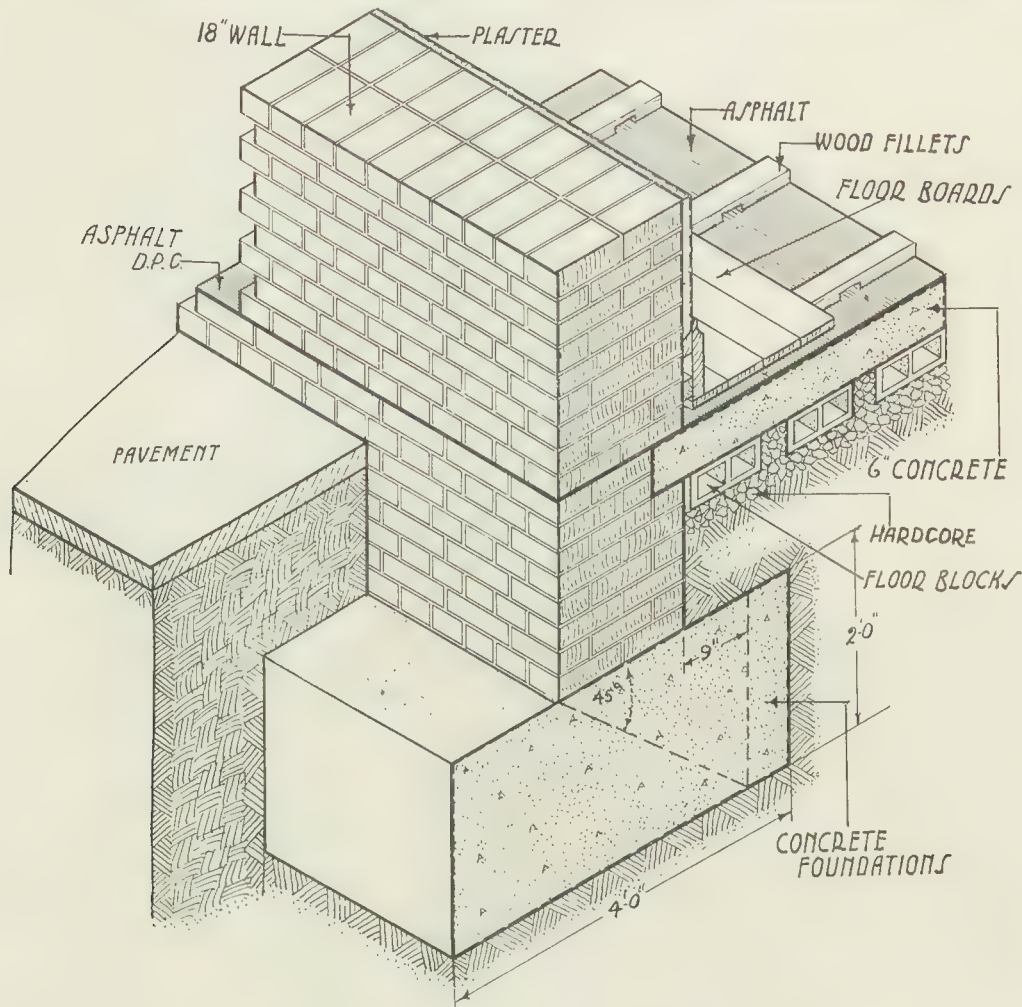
SECTION THROUGH BASE OF WALL WITHOUT FOOTINGS
